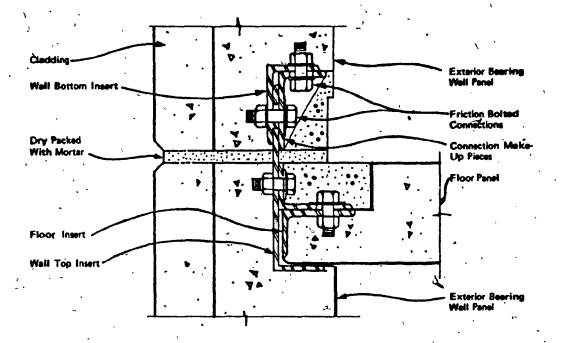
D/C, Exterior Wall to Floor Connection (Ref. 32)
